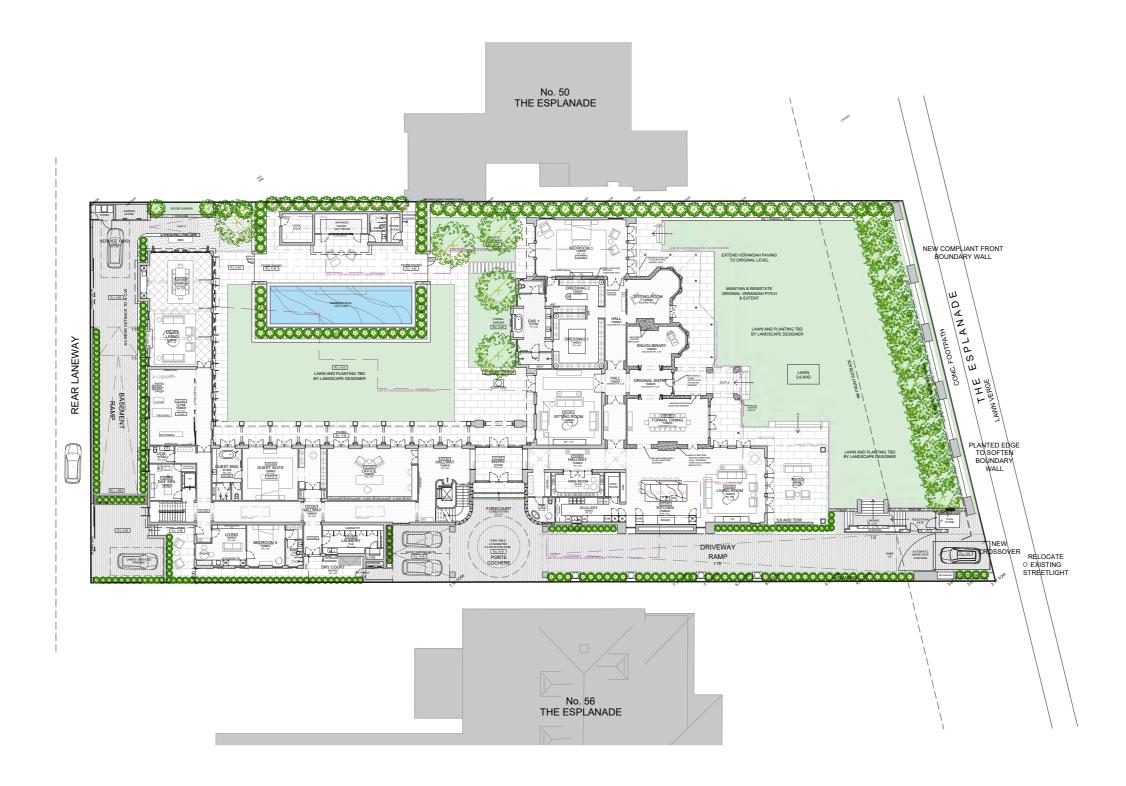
52 The Esplanade, Proposed Site Plan. (Source: Philippa Mowbray Architecture & Interiors 2023)
